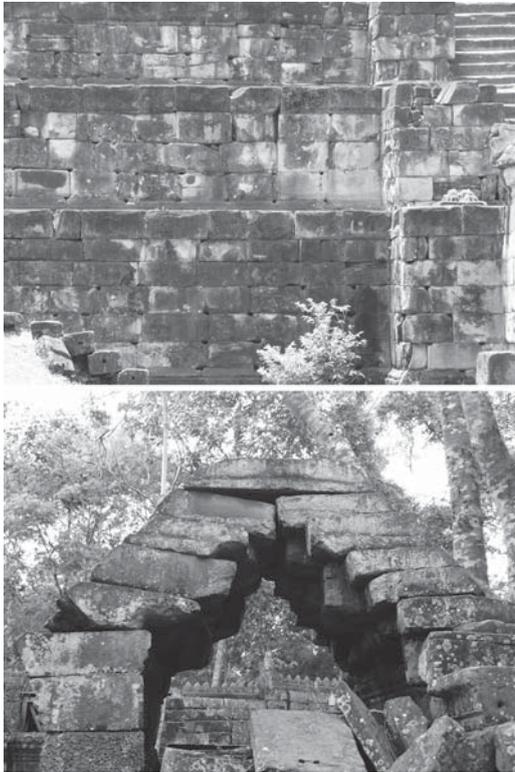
Poor wall bonding of pyramid masonry of Bakong; collapsing corbelled vault of gallery of Ta Nai temple (Source: author)
